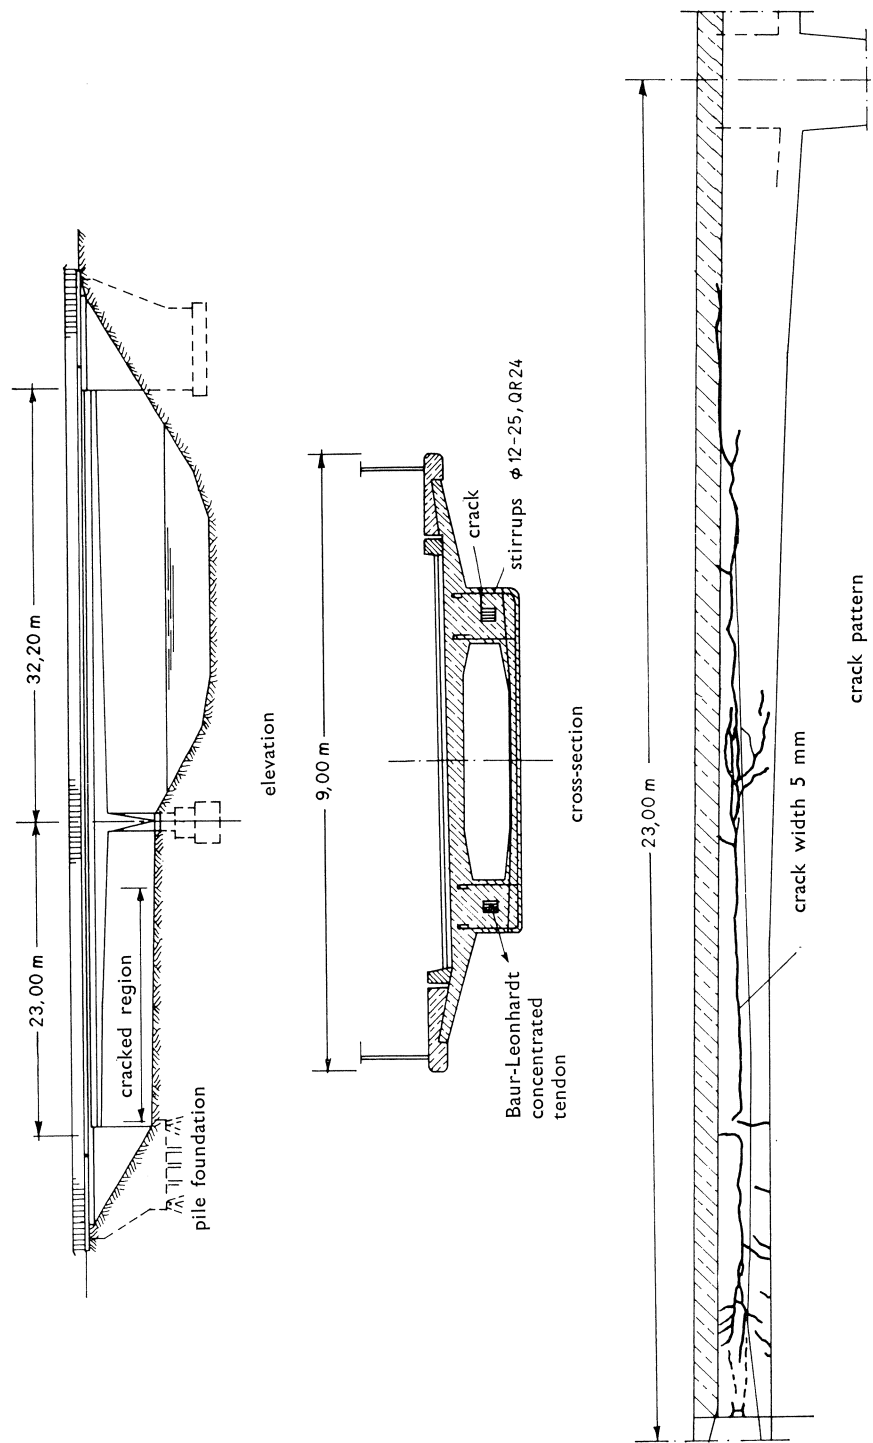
Cracking of a bridge due to temperature effects (Jagst bridge, described in Beton- und Stahlbetonbau, 1965, No. 7).
